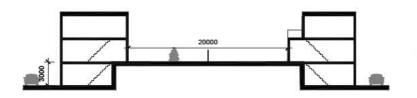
Raising ground levels between buildings to create amenity space accessed from habitable rooms above street level
